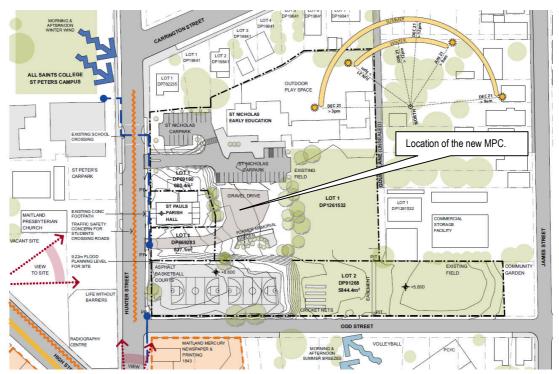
The current Site plan showing the Hall. (SHAC Sheet 1008)
